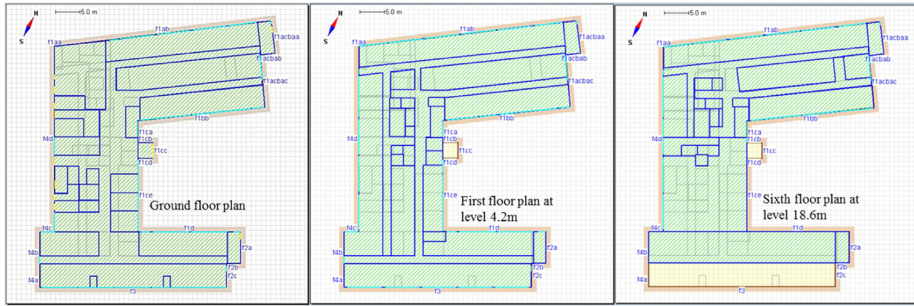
Typical ground floor plan, first-floor plan at level 4.2m, and sixth-floor plan at level 18.6m with thermal zones as described in Table S2, modeled in IDA ICE.
